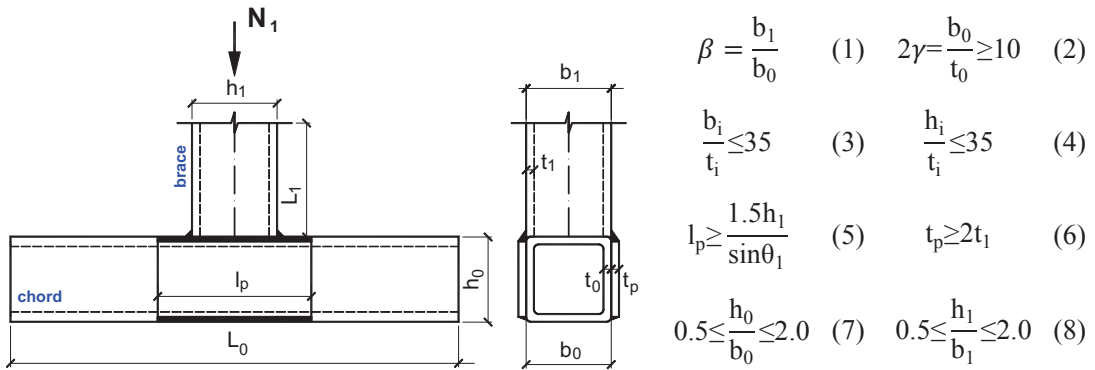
Reinforced tubular joints with sidewall plates – geometrical properties.
